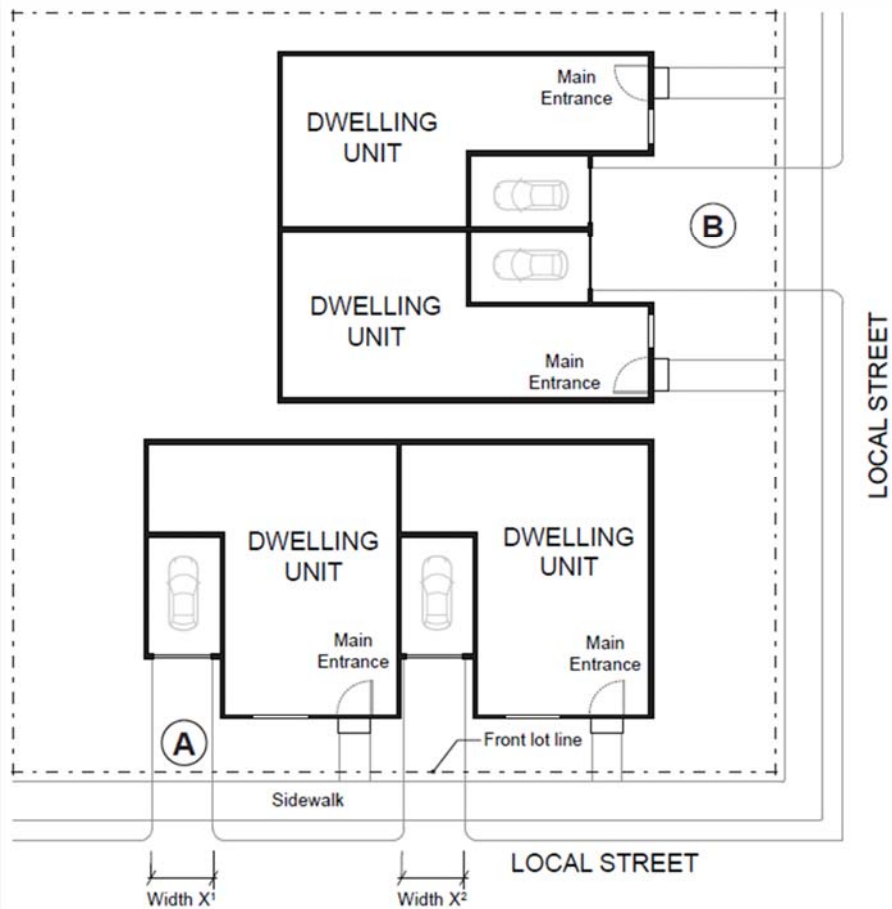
I. Driveway Approach Options for Multiple Local Street Frontages
